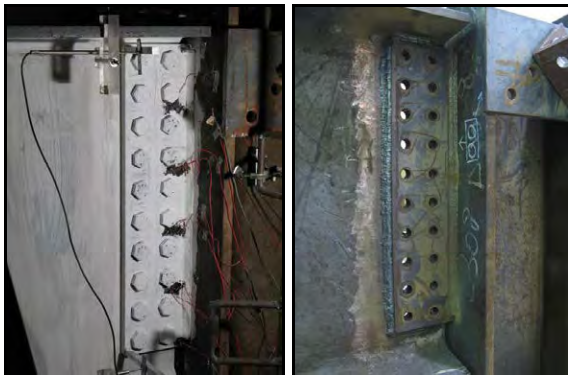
Typical bolted shear tab connection with matching weld-retrofit detail
